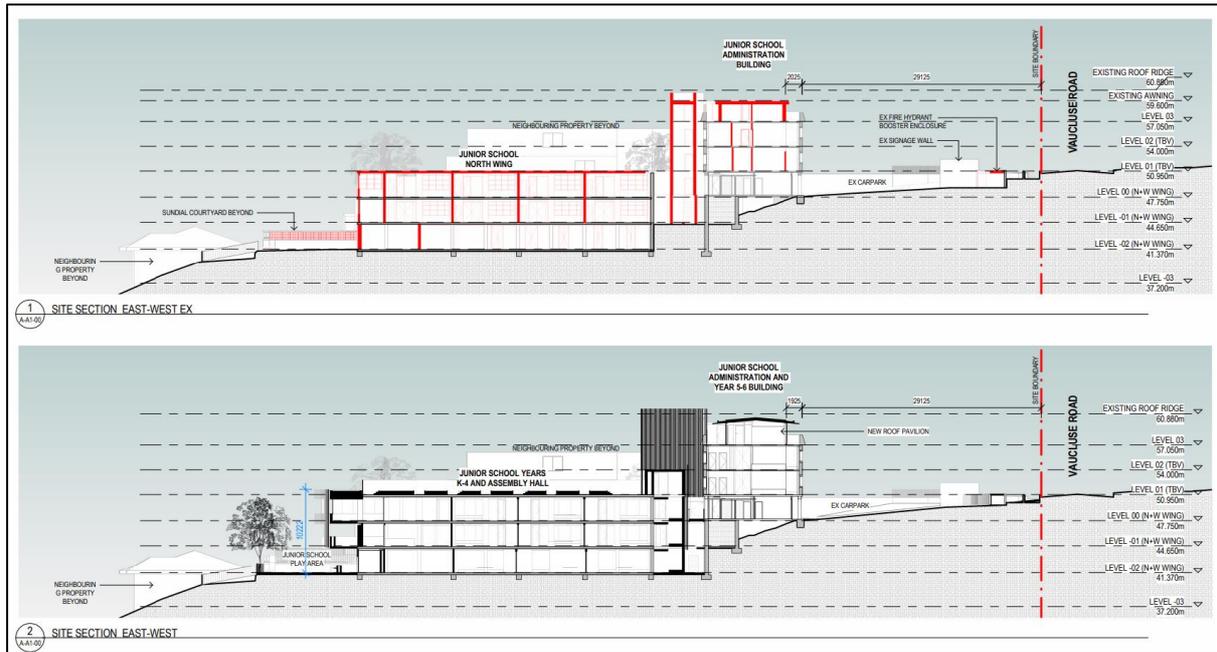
| Junior school before and after section (Source: Applicant's RtS 2021)
